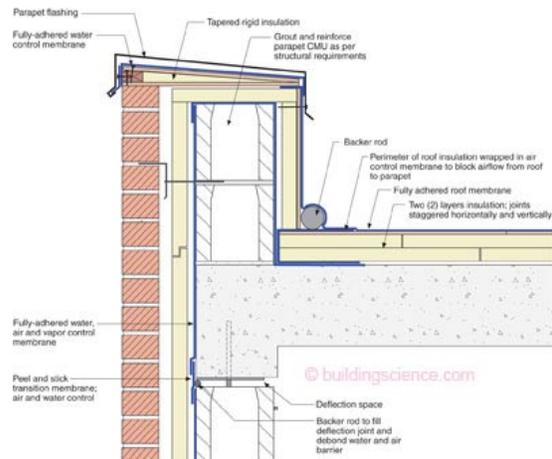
The Masonry Parapet—The thing to note here is that the concrete deck is the air control layer so an additional one is not necessary. However, joints in the concrete deck need to be addressed for air control layer continuity.
